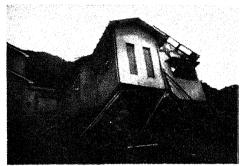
Completely destructed house caused by destruction of light gauged steel structure at the first floor (Shimogamo)
